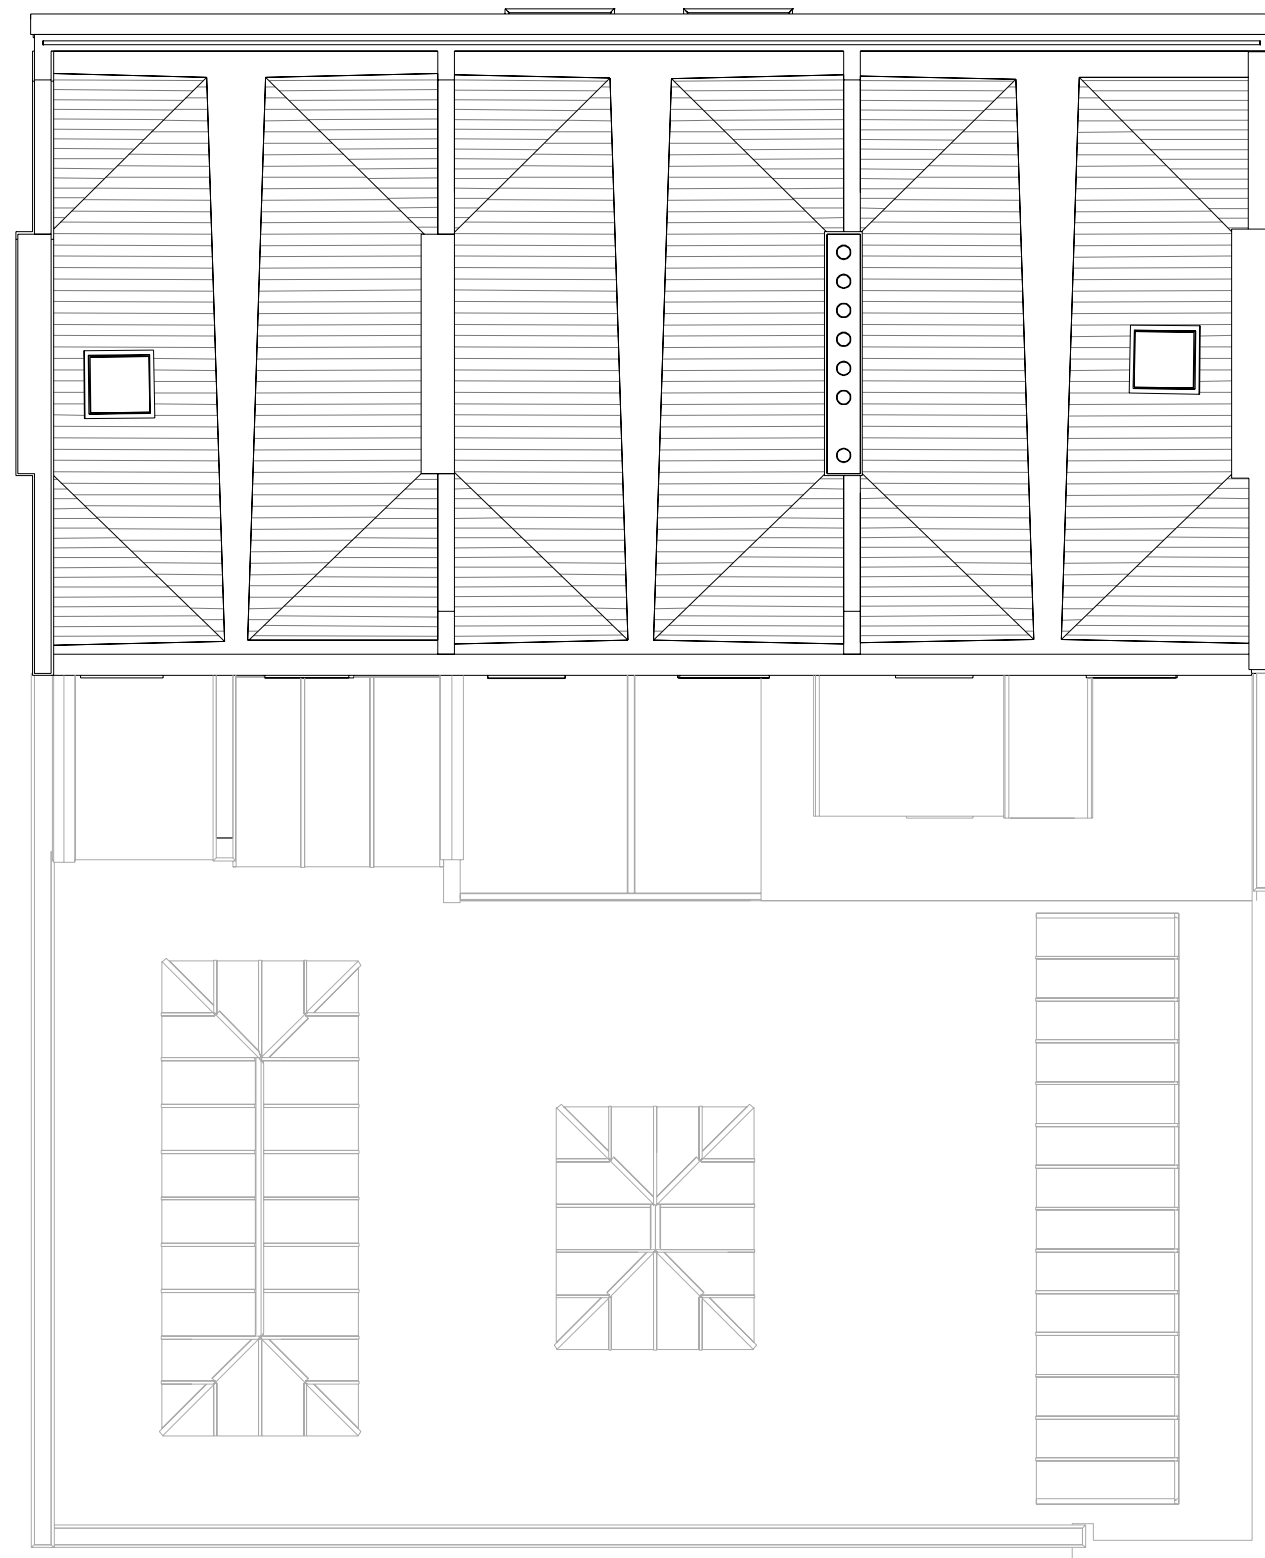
Existing Roof Plan . Scale 1:100 @A3
